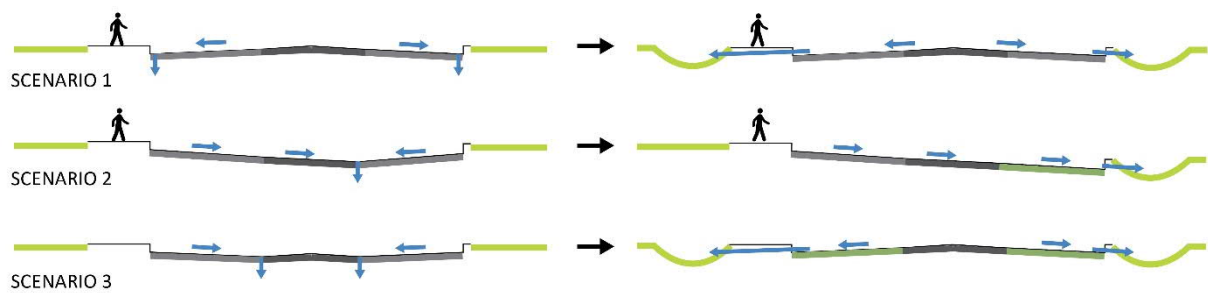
SCHEMATIC CROSS-SECTIONS OF THE TRANSFORMATION OF PARKING SURFACES
